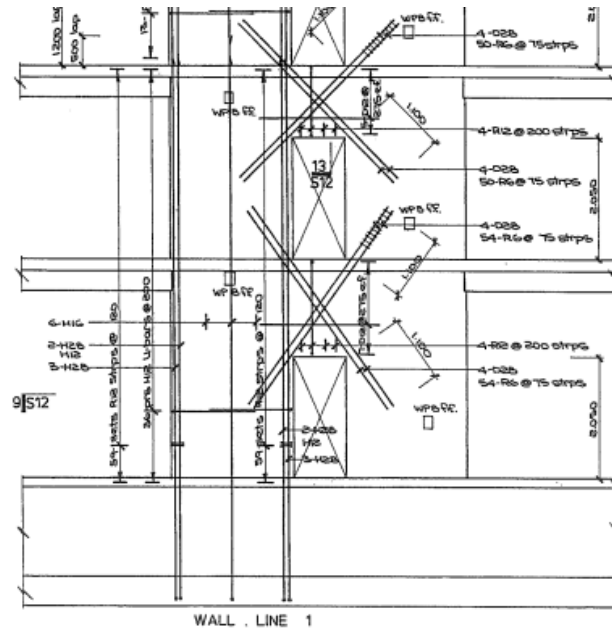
Southern shear wall typical coupling beam reinforcement arrangement [1]
